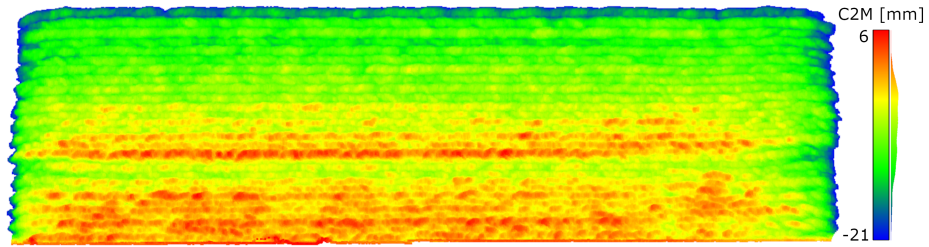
Digital model (FIM) of the simple straight concrete wall.
